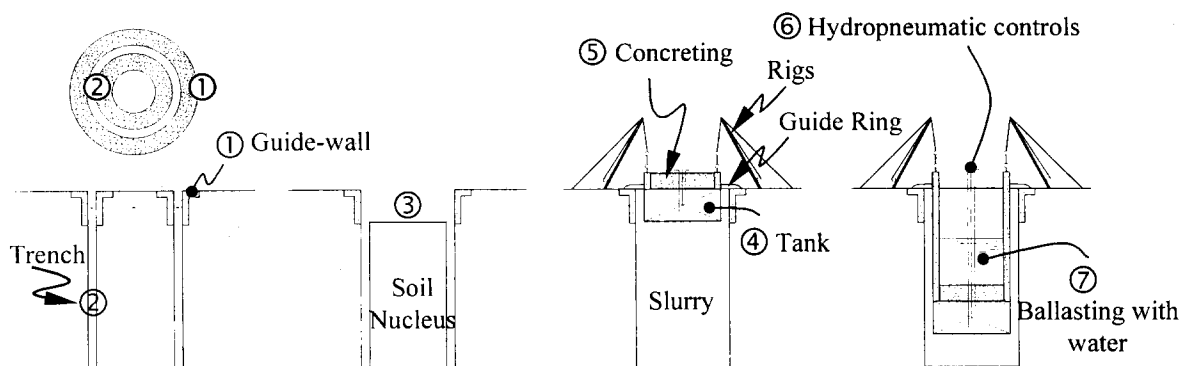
Wet Excavation and Floating Construction Mexico City (Modified from Auvinet and Organista, 1998)
